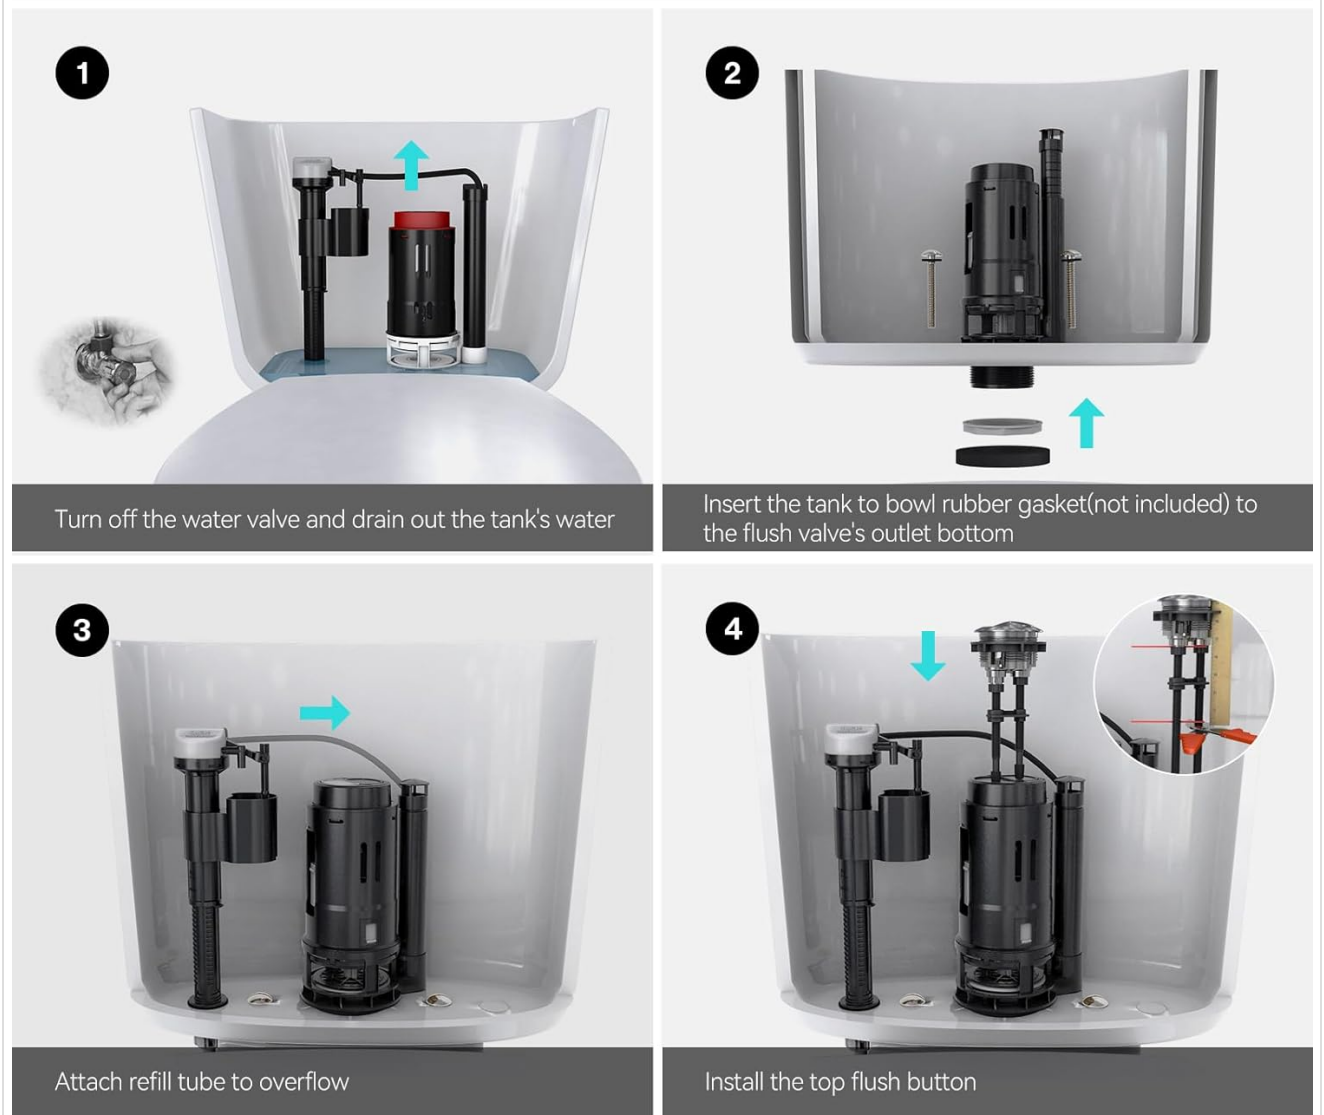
Gasket Placement. This image illustrates the placement of the tank-to-bowl gasket (if applicable) onto the flush valve.
